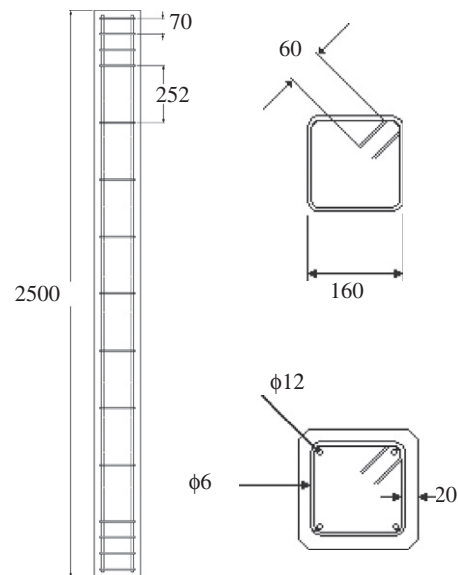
Reinforcement details of tested columns (dimensions in mm).
